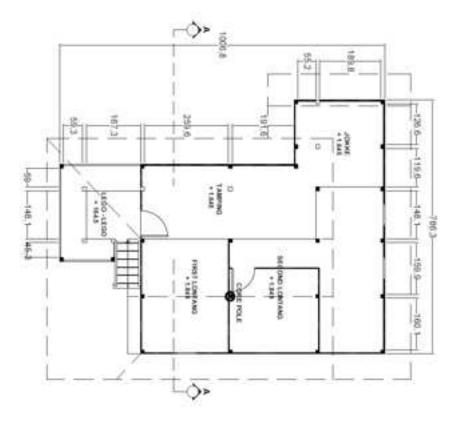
Z1-BN-40: Floorplan. Source: Field survey 2017
